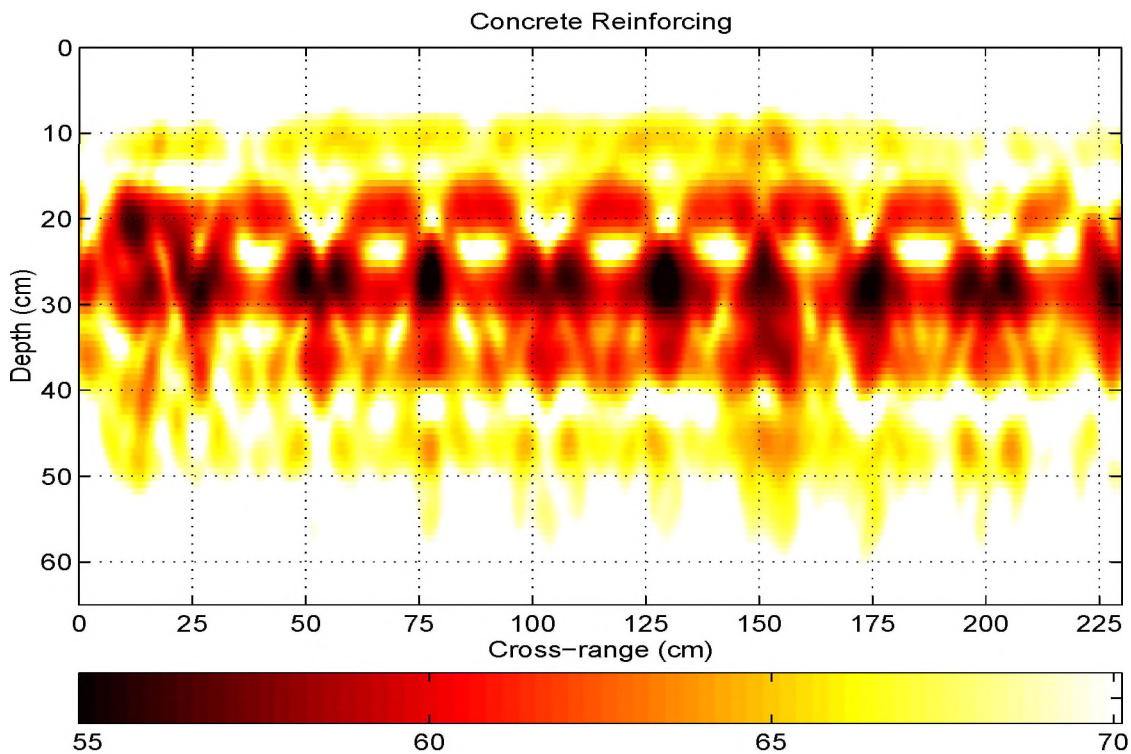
SFGPR image of reinforcing bars in concrete pavement.
